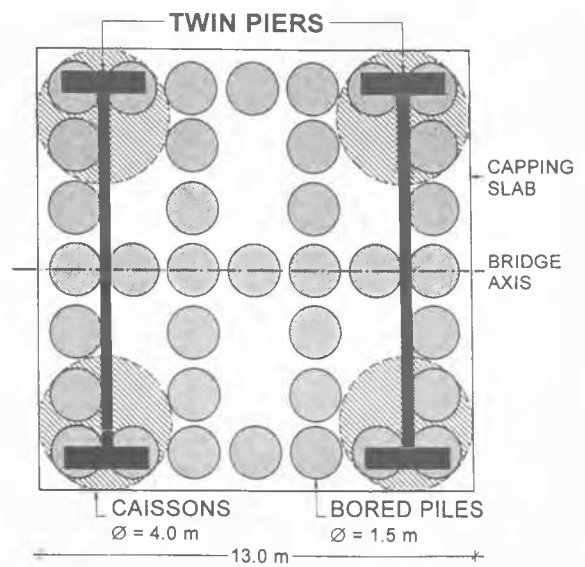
Ground plan of the foundation of another twin pier of the 1100m long highway bridge.
